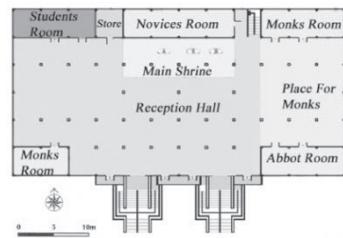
First Floor Plan of Bein-Daw Kyaung^{*16}
